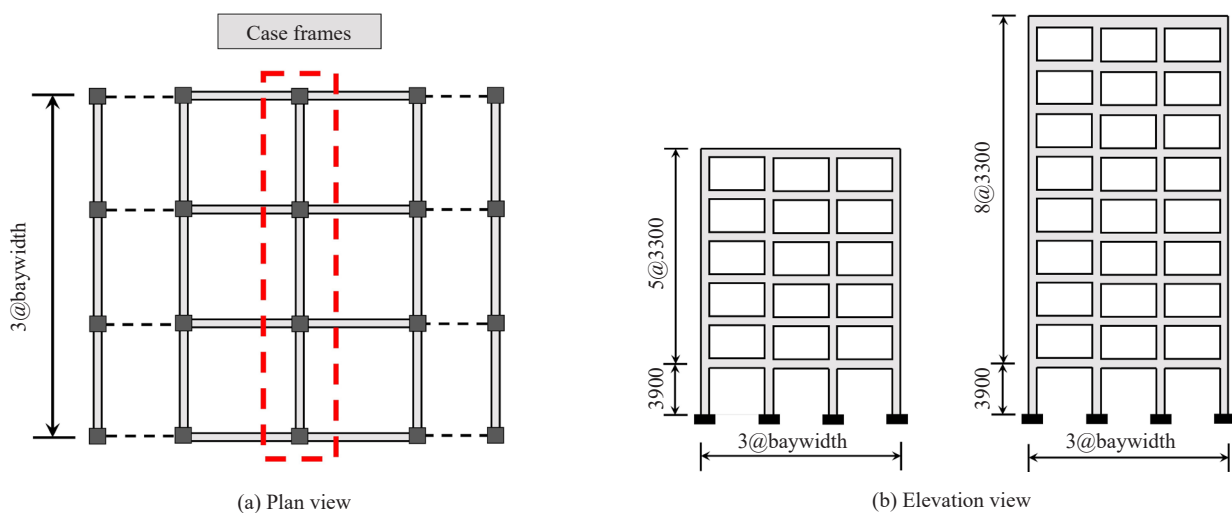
Plan and elevation views of case RC frames (unit: mm)
